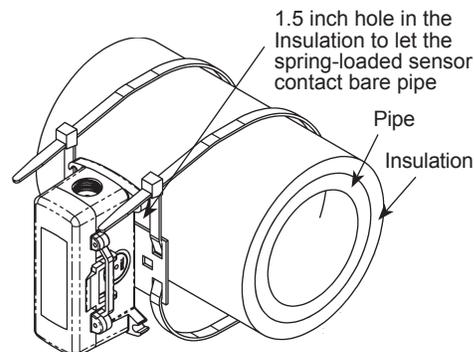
Spring Loaded Strap Unit Mounting (BAPI-Box 2 Enclosure shown but mounting is similar for all BAPI-Boxes.)
